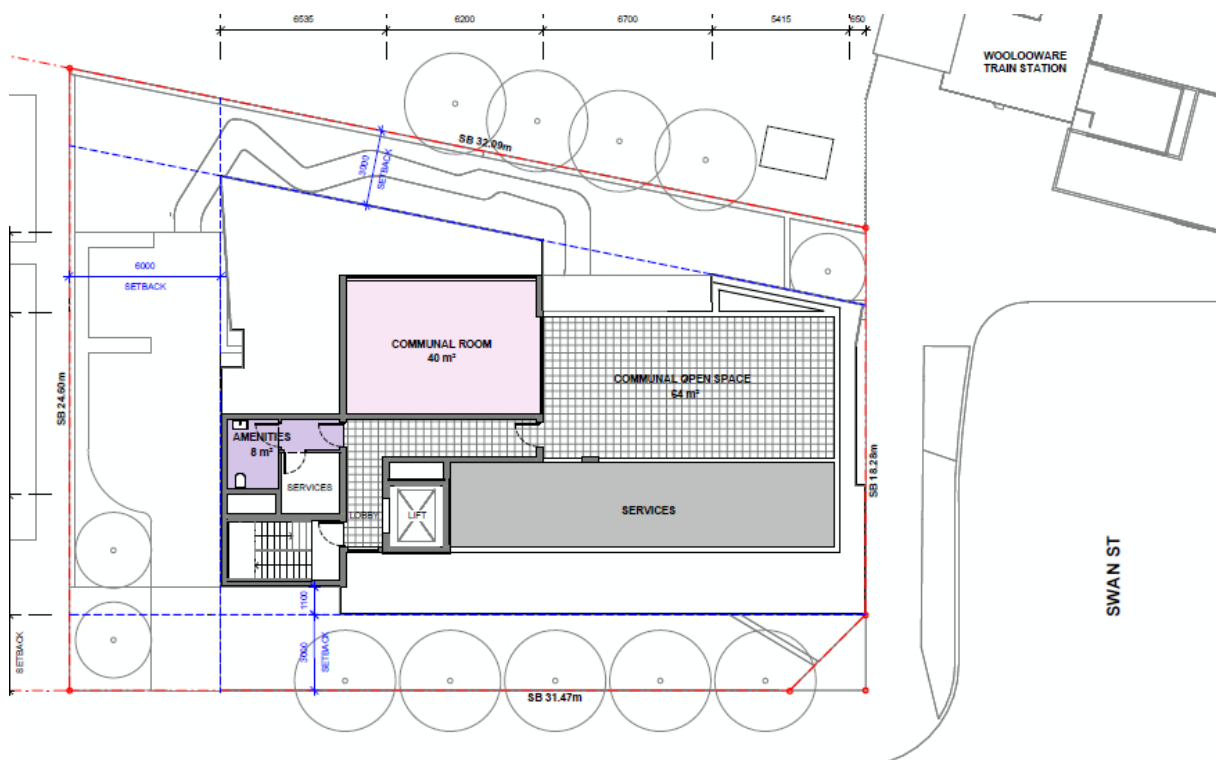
Proposed roof level layout (source: Stanasic architects, 2025)
